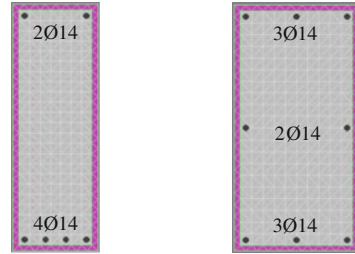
a Typical X–Z sectional view, b Typical Y–Z sectional view
